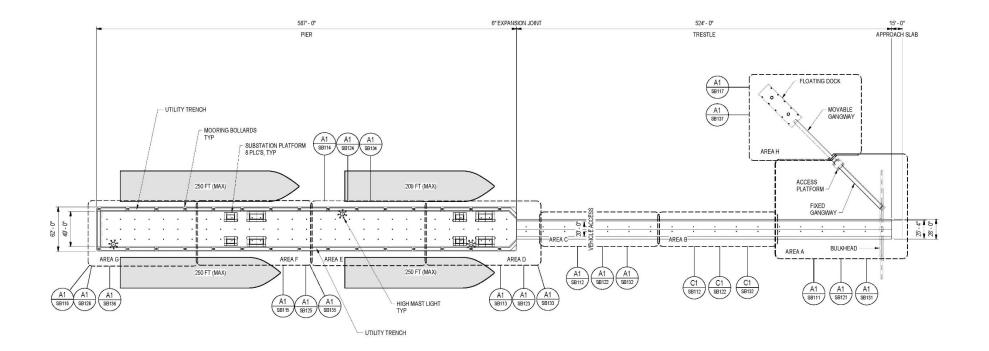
Plan View of Pier, Trestle and Floating Dock
